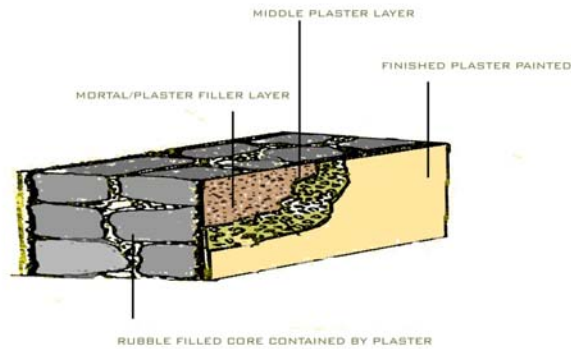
Wall Construction detail. Source: Bert De Vries 1982
